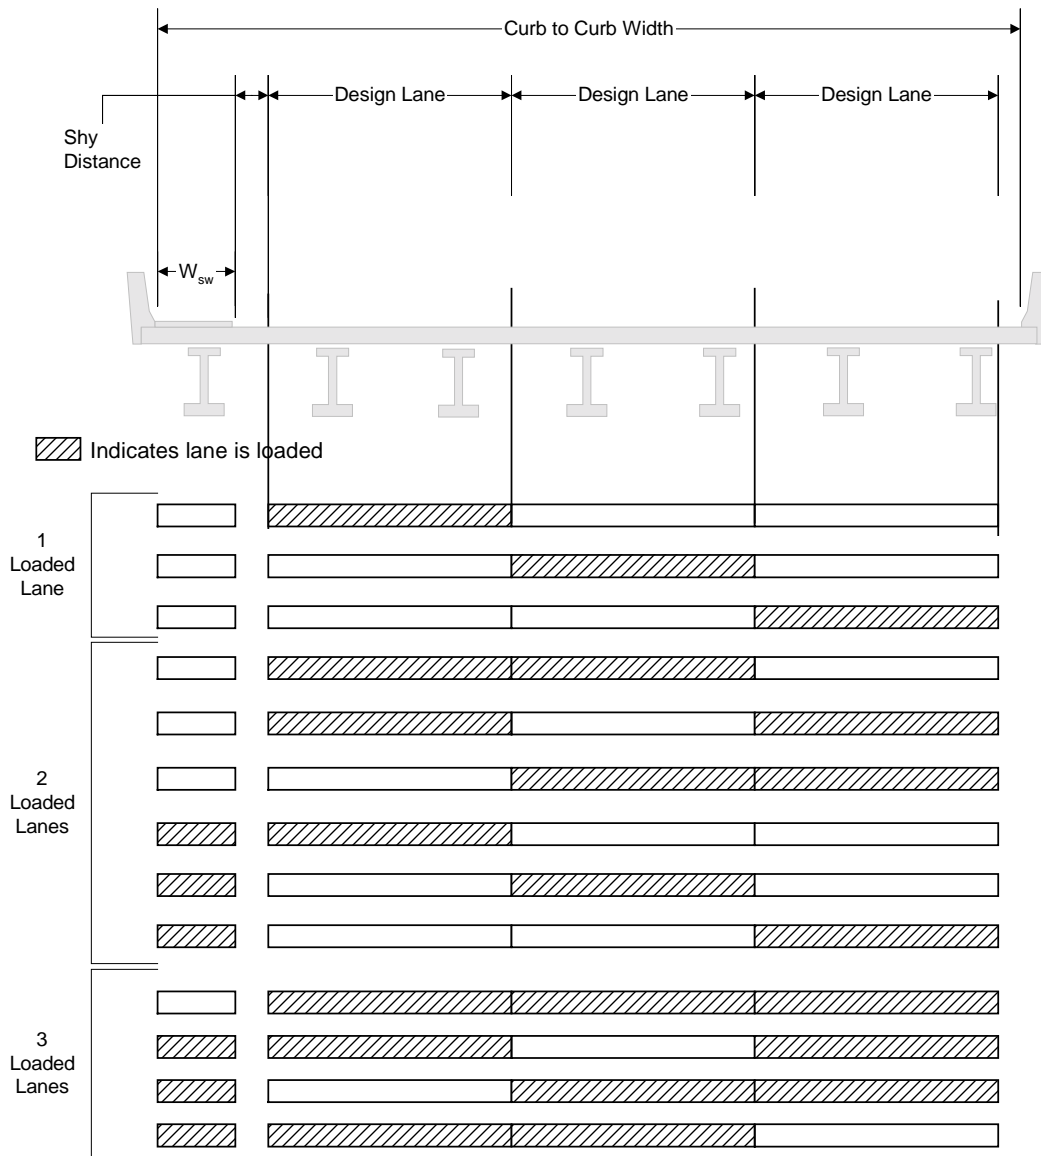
Permutations of Loaded Design Lanes for a 3 Lane Structure with a Sidewalk
